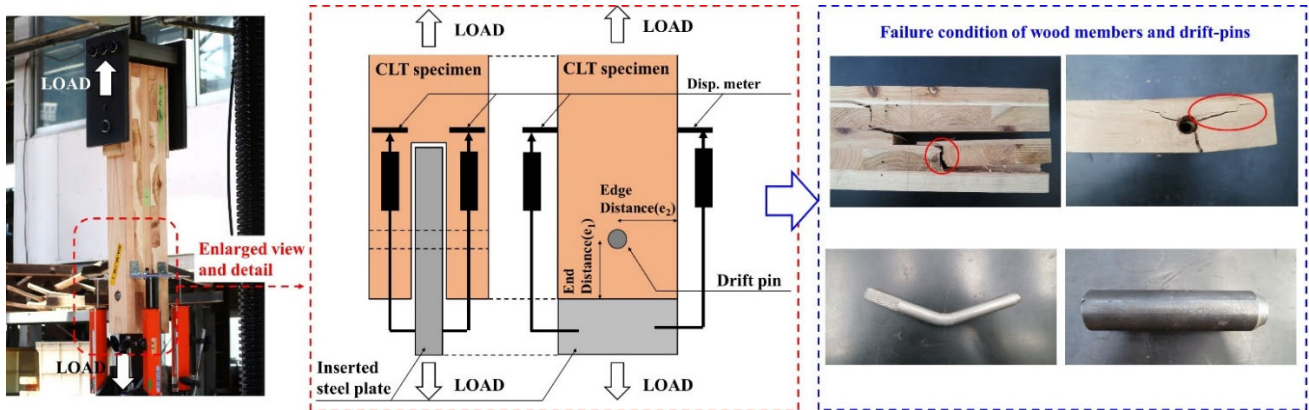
Test and failure condition of tensile loading with inserted plate connection with drift pin for CLT
